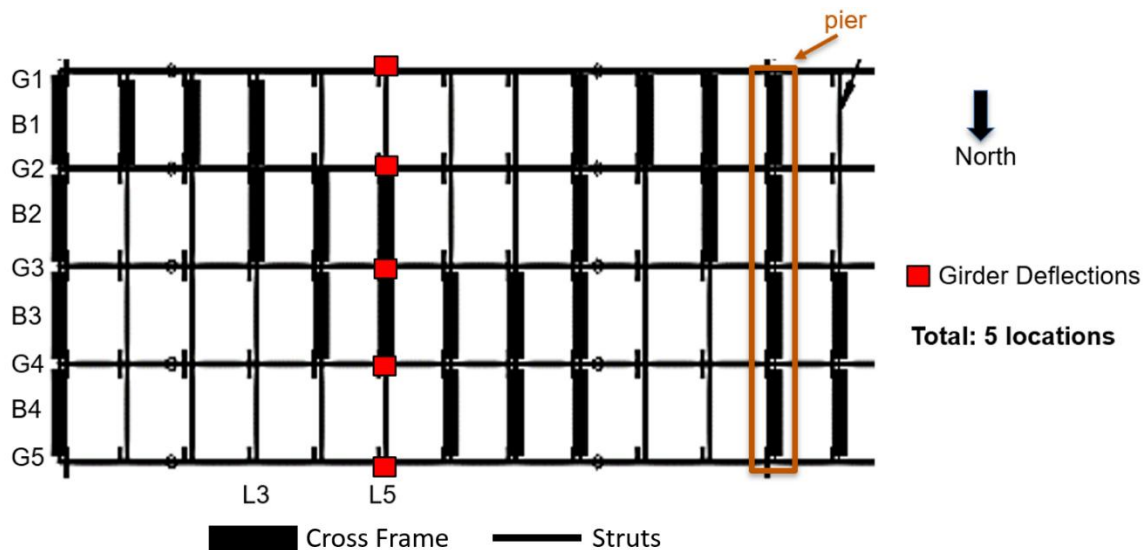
SH 105 Bridge Span 6 Girder Displacement Layout
